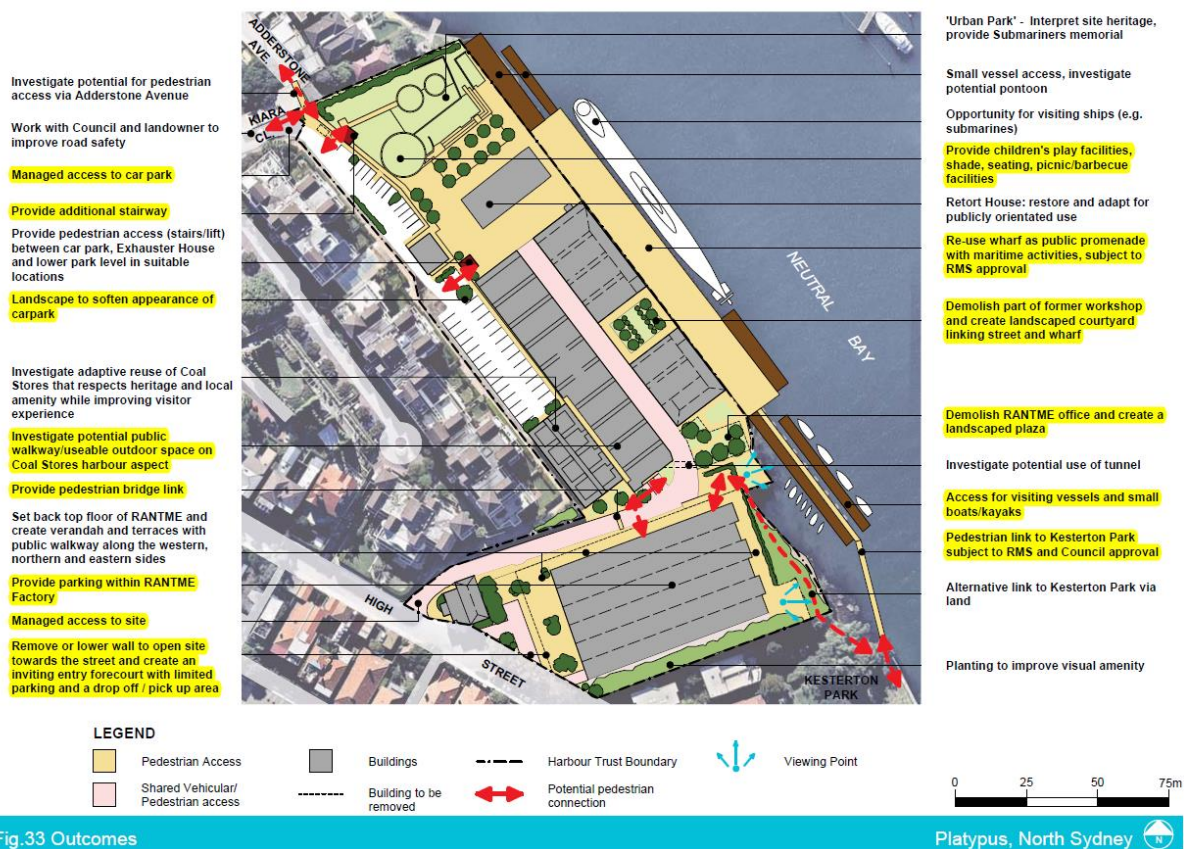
Extract from the Platypus Management Plan showing detailed outcomes for the site. Outcomes relevant to this proposal are highlighted in yellow. Source: *Management Plan Platypus, North Sydney* (2016), pg. 49
